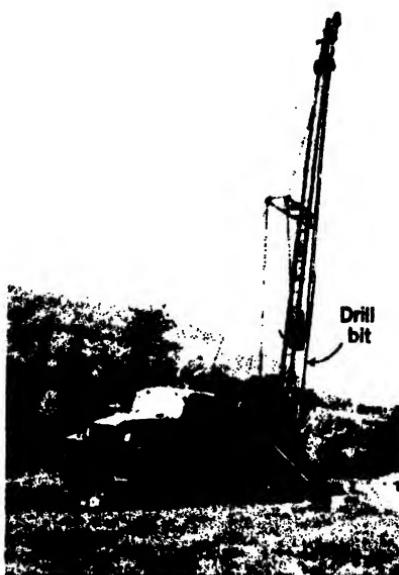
A well-drilling rig in position for drilling. The heavy drill with a cutting bit on the lower end is lifted and dropped by the rig so that a hole the size of the bit is drilled down into the earth's crust to a water-bearing stratum. Periodically the drill is pulled from the hole; the hole is flushed with water and then bailed with the bailer to remove the cuttings of the drill. Using this same rig the driller drives a casing down into the hole at least to bedrock to prevent cave-ins and to seal out surface water.
